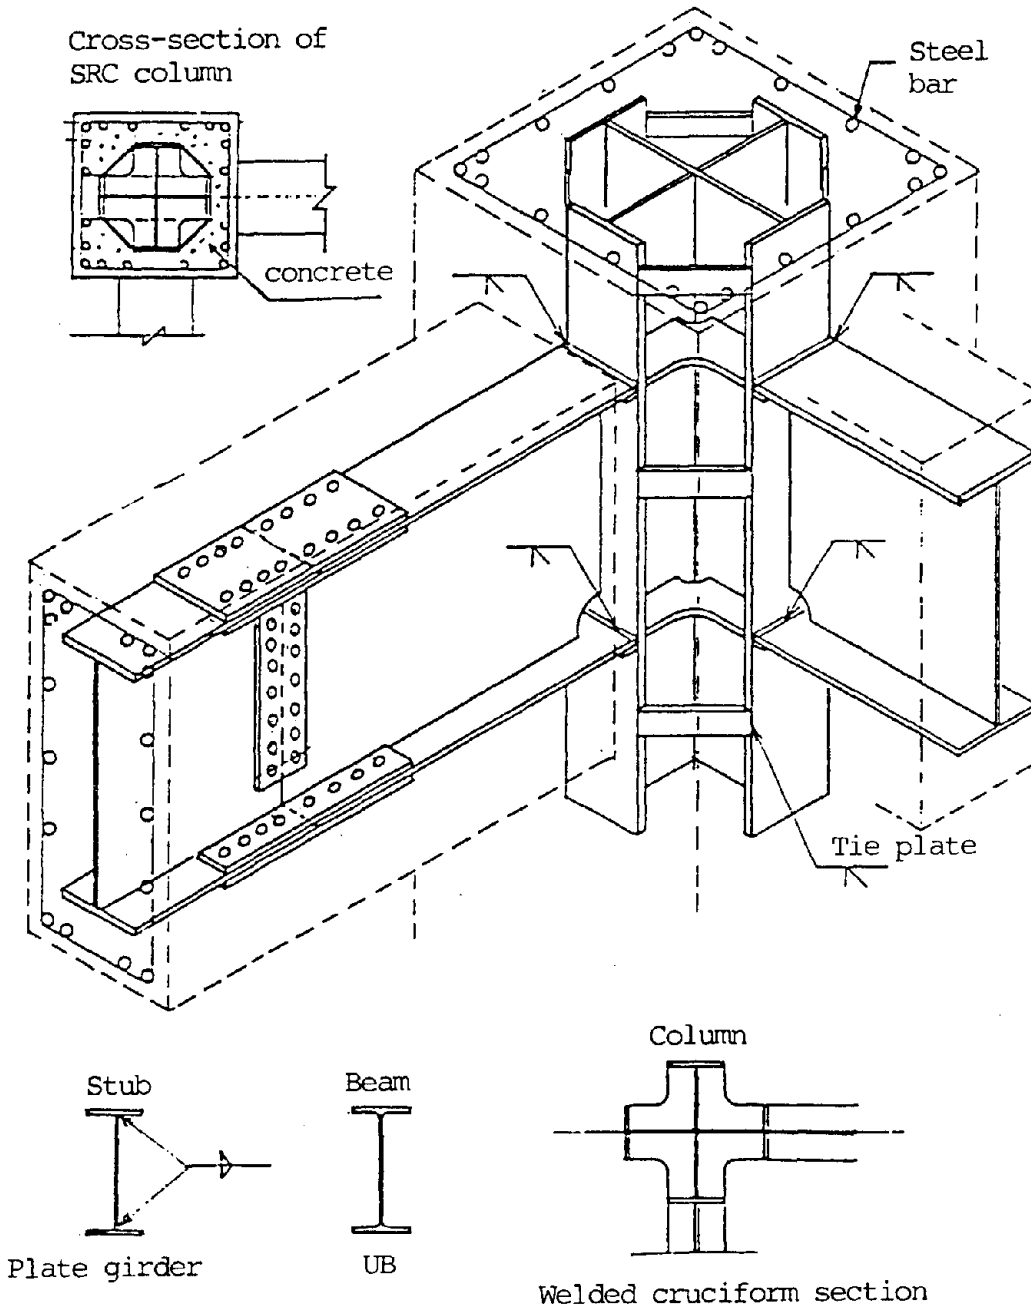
Construction details for SRC [upper and left drawings-AIJ, 1960; lower right drawing-AIJ, 1970; next page drawing-Chiba, 1989]
